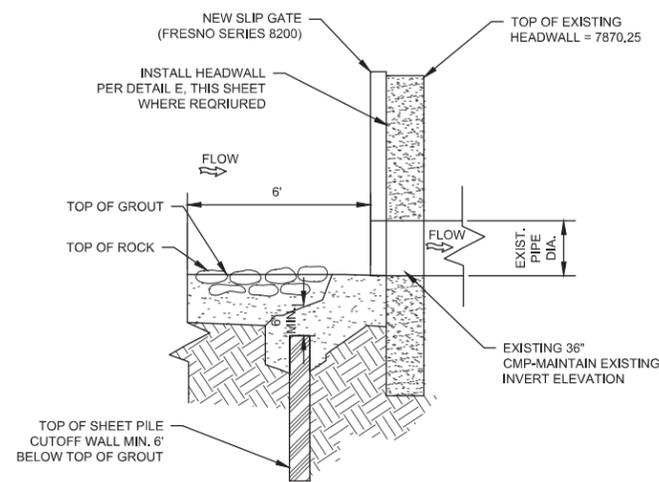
DETAIL D - "NRCS" EMBANKMENT PROTECTION
